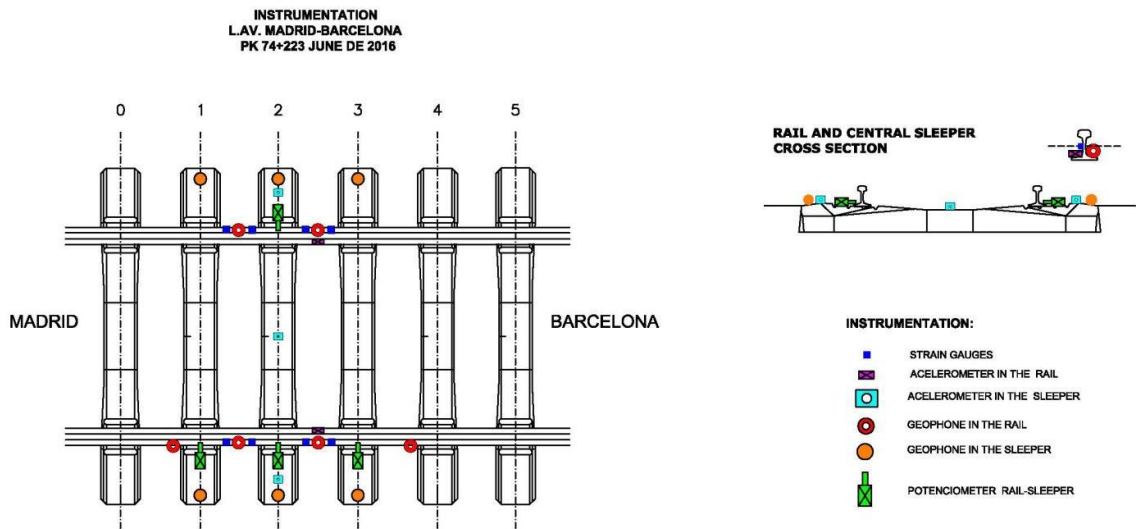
SKETCH OF THE INSTRUMENTATION INSTALLED FOR THE SECOND CAMPAIGN
